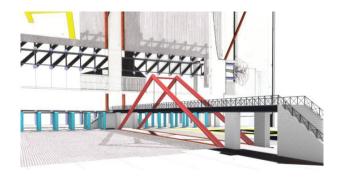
3D modelling reconstruction of the G. Polesello project for Accademia Bridge.
